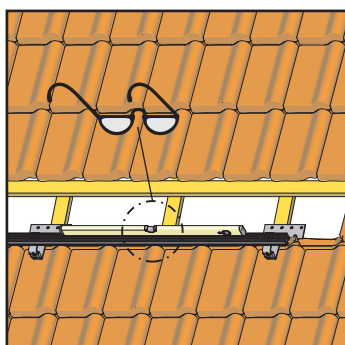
After connection, align the profiles horizontally or with a slight gradient
